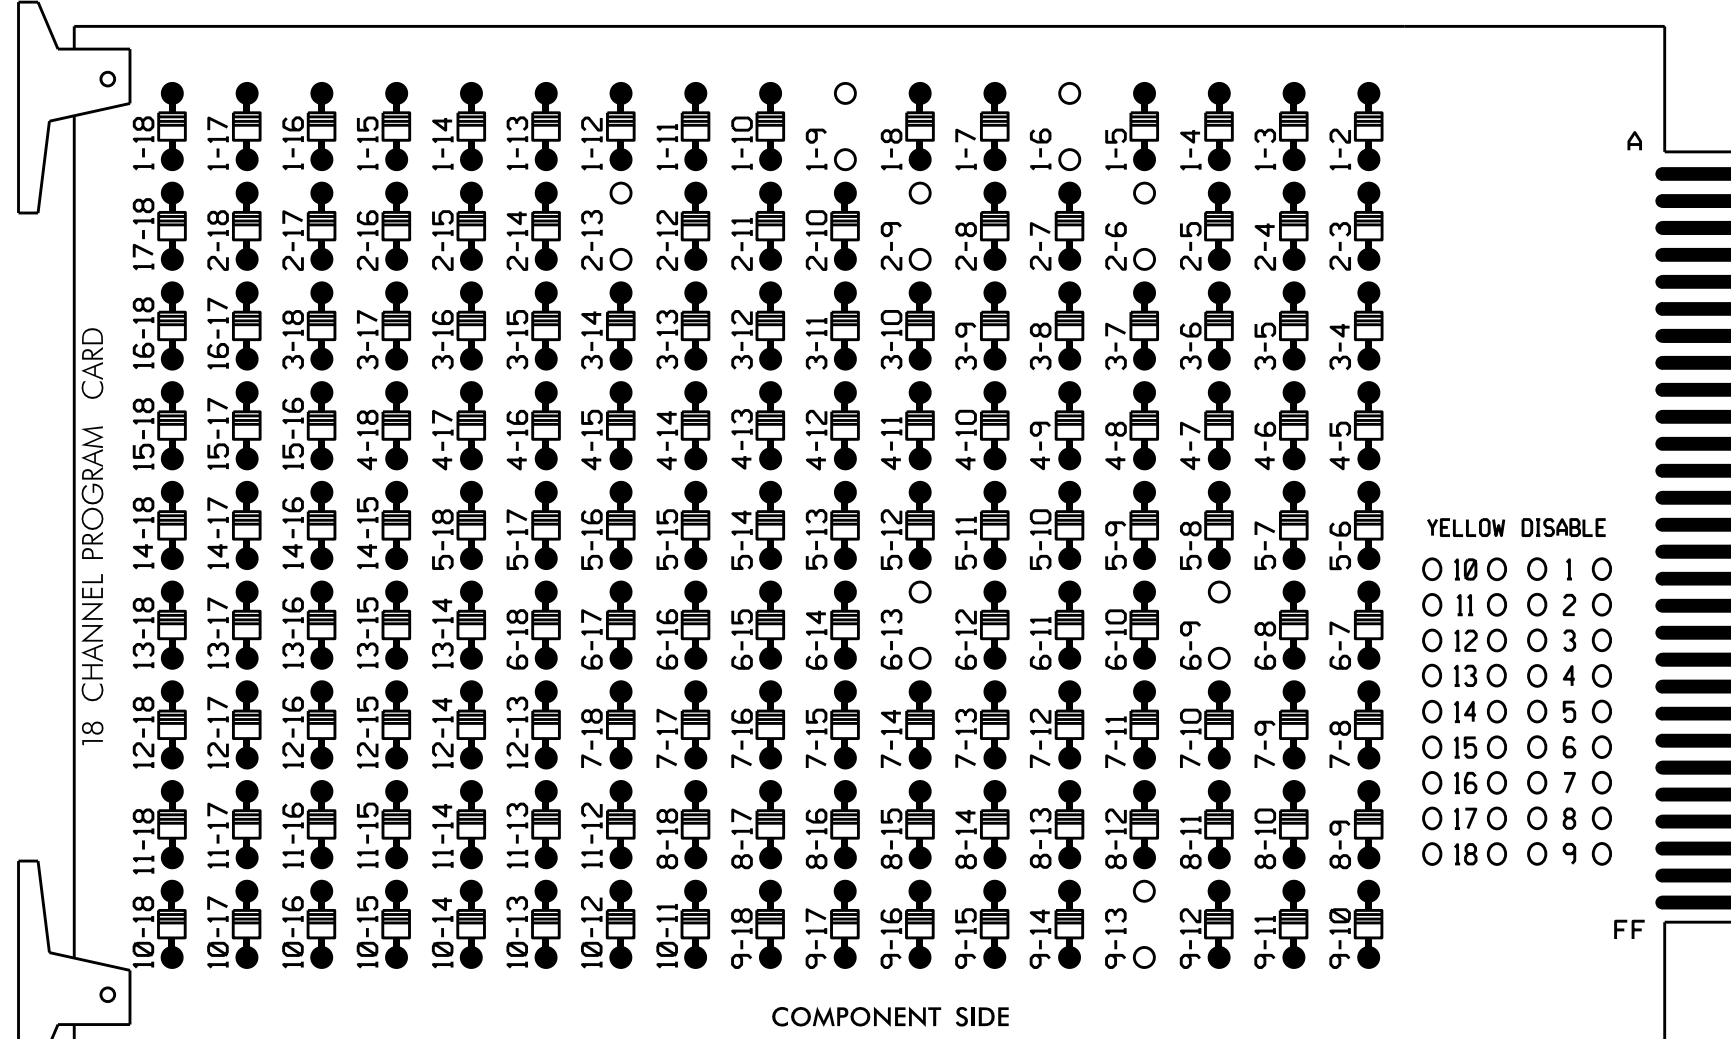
(South Alston Avenue) at NC 147 NB Ramp / Gann Street
